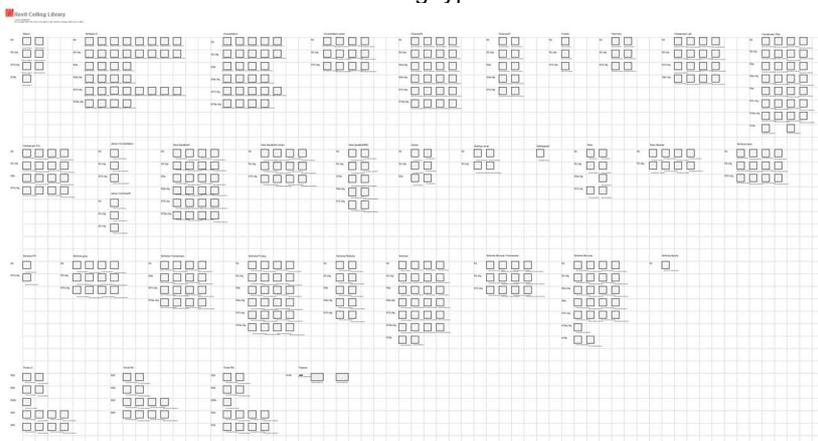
Ceiling Plan View in the file Revit Ceiling Library.rvt.
